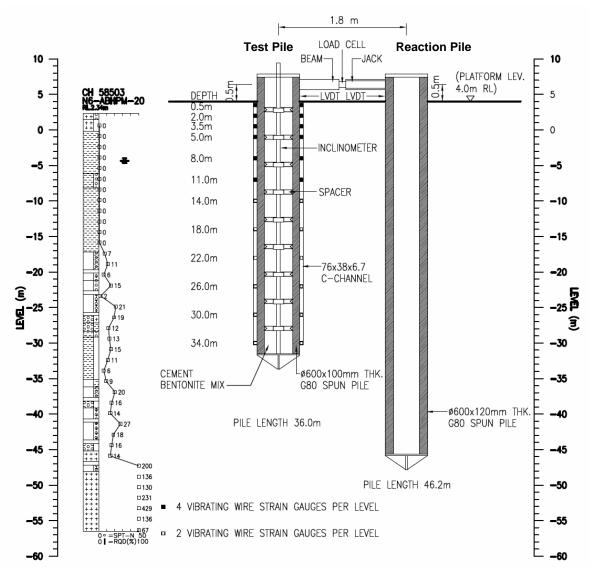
Elevation View of Testing Setup and Instrumentation Details
